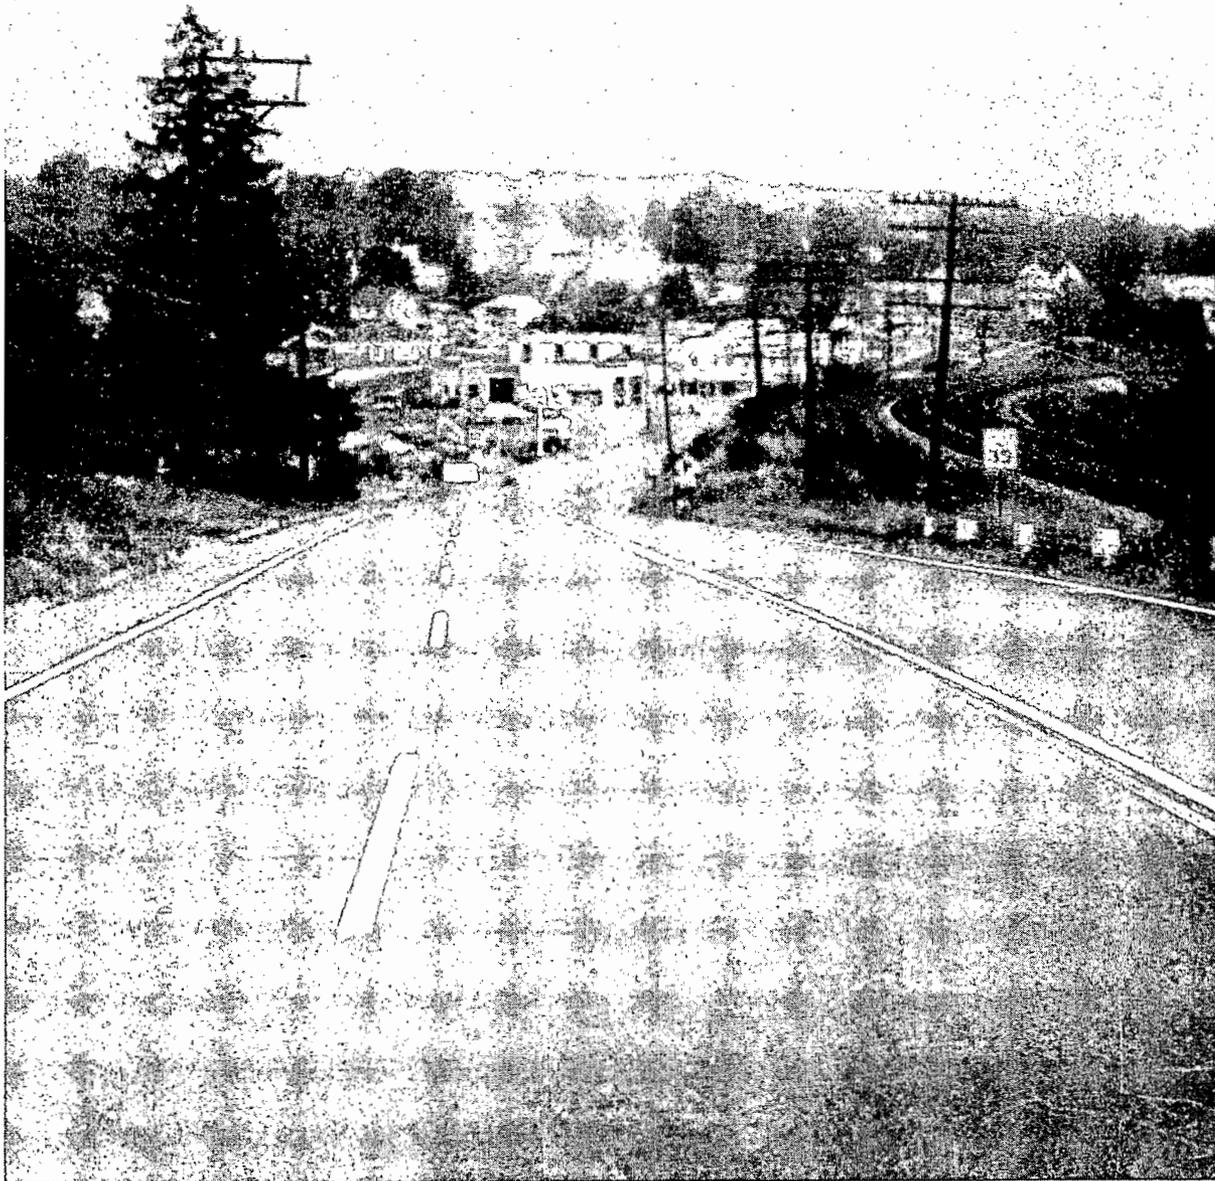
U.S. Route 611 (picture taken from the Church Street intersection facing south).
